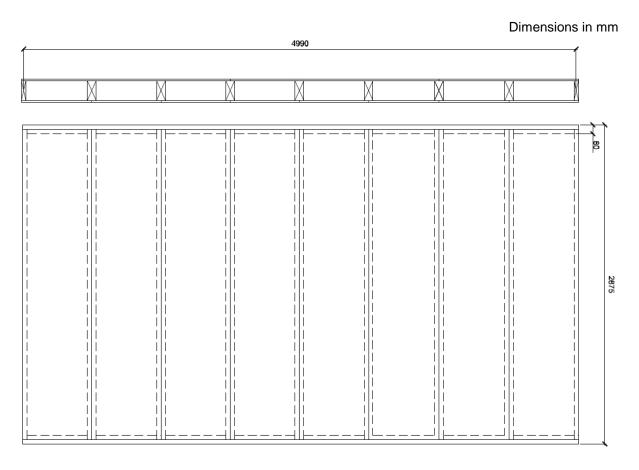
Racking resistance in floor and roof plain, alternative 2
